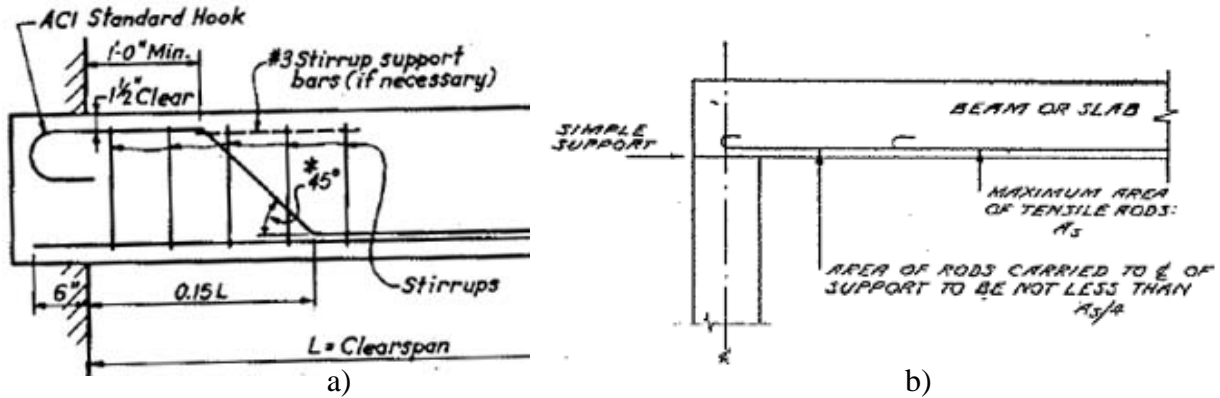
a) ACI-318:1963 [7] specification for end-span beam-column joint [3]; b) NZS95:1955 [160] requirement for the tension reinforcement in beams/slabs to be anchored into the support [95].
